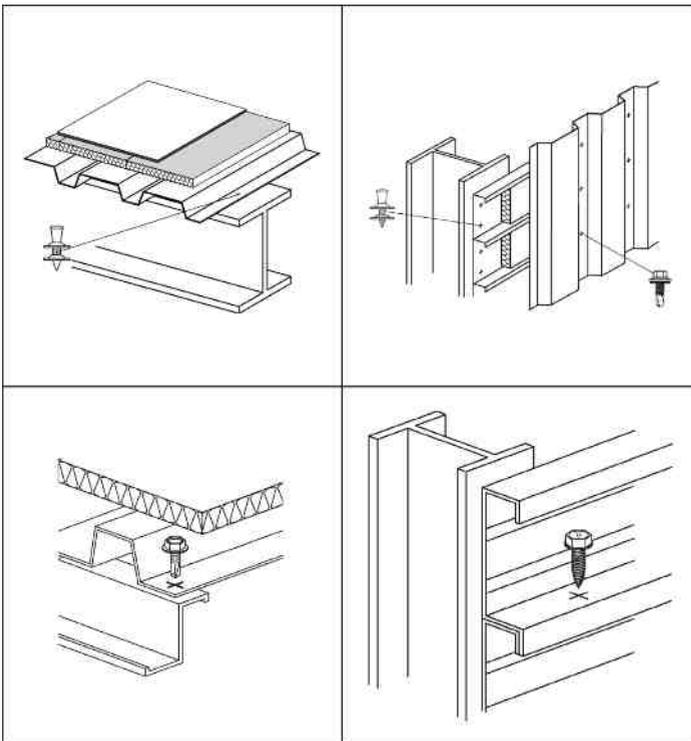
Use of powder-actuated fasteners and screws in light-gauge steel construction
